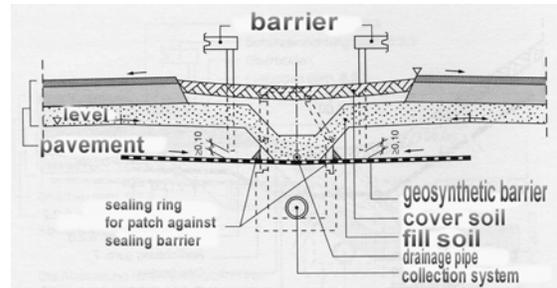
Basic drawing for a road cross-section zone III "central reserve"
